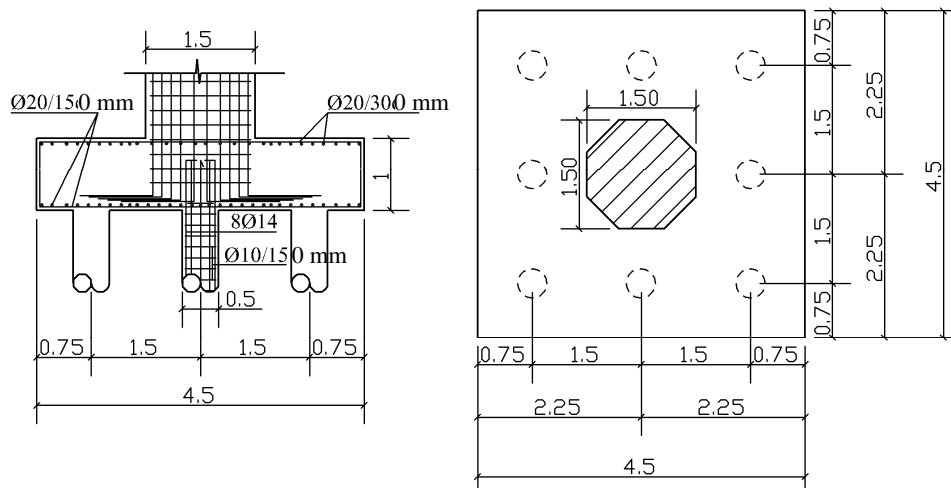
Alnasha Bridge Pier #6 and Pier #7 pile footing details (Dimensions in meter).
